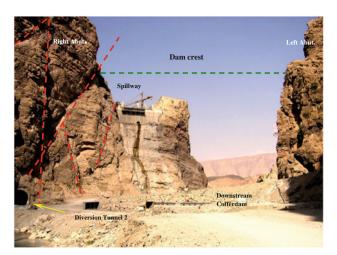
Seymarch Dam foundation rocks and associated structures such as diversion tunnels, spillway and downstream cofferdam (2007)
